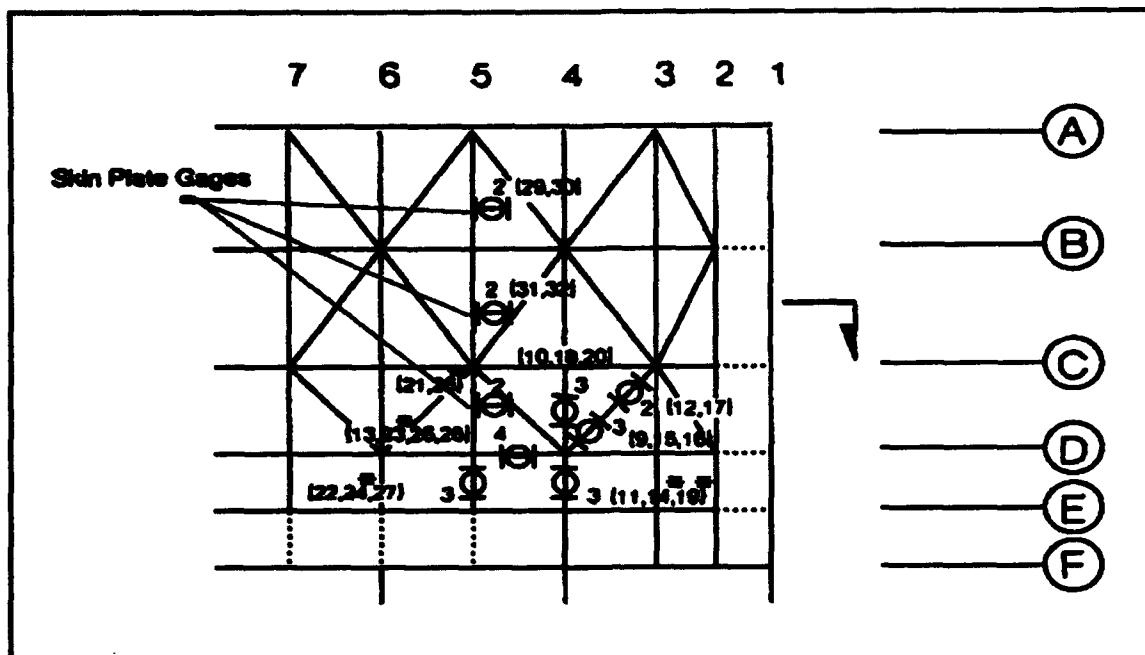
Transducer locations: Locks 27 SET1-27 - enlarged view
